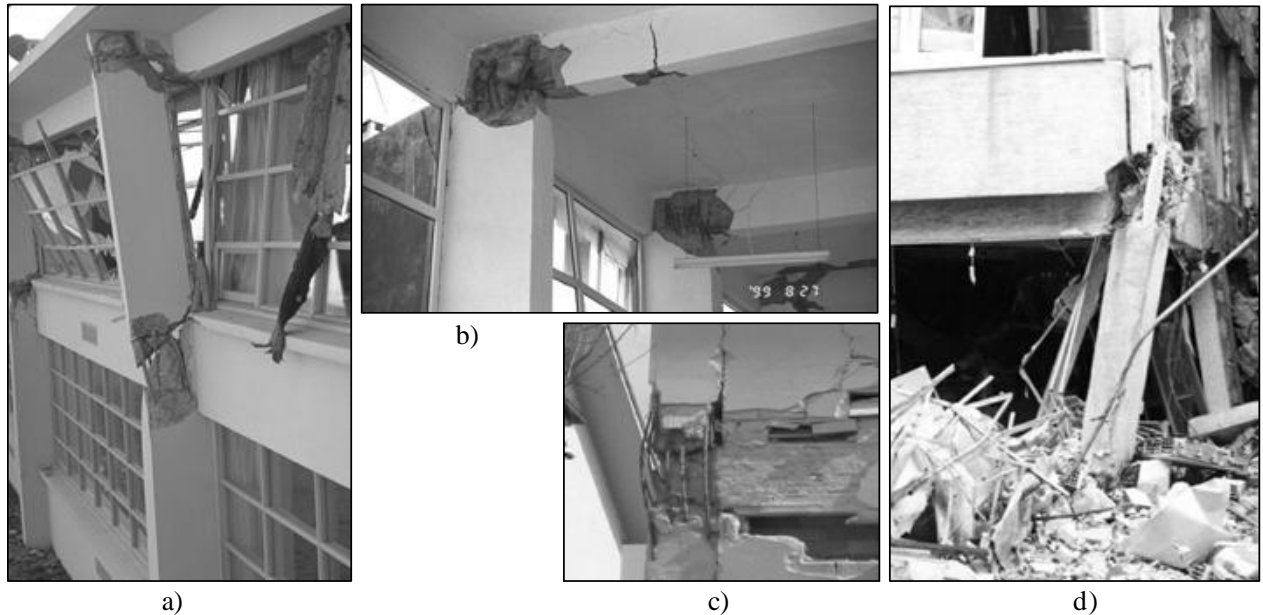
Damage to exterior beam-column joints: a) one-way exterior joint (1964 Alaska (US) earthquake) [19]; b) one-way exterior joint (1999 Kocaeli (Turkey) earthquake) [10]; c) corner joint (2009 L’Aquila (Italy) earthquake) [20]; d) corner joint (1999 Kocaeli (Turkey) earthquake) [10].
